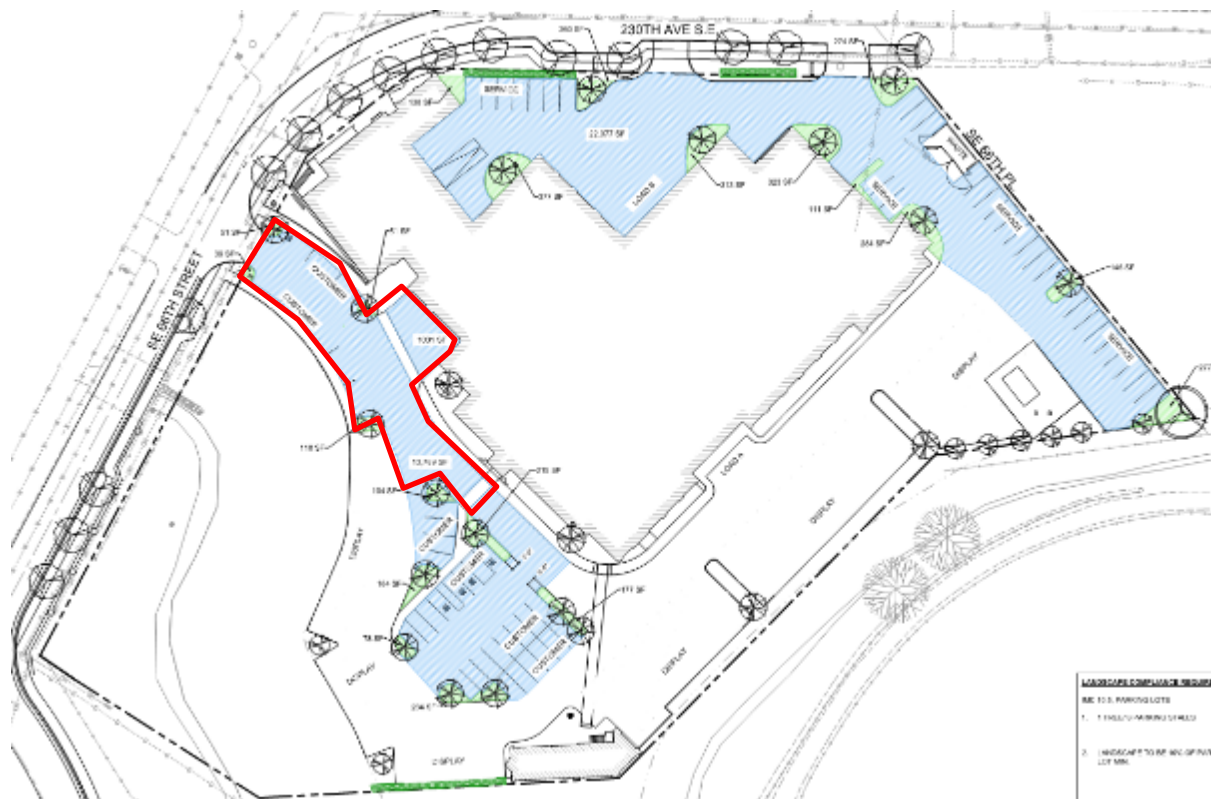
Parking landscape plan. Note the area outlined in red is part of the private road frontage and does not count toward the total parking lot landscaping requirement.
